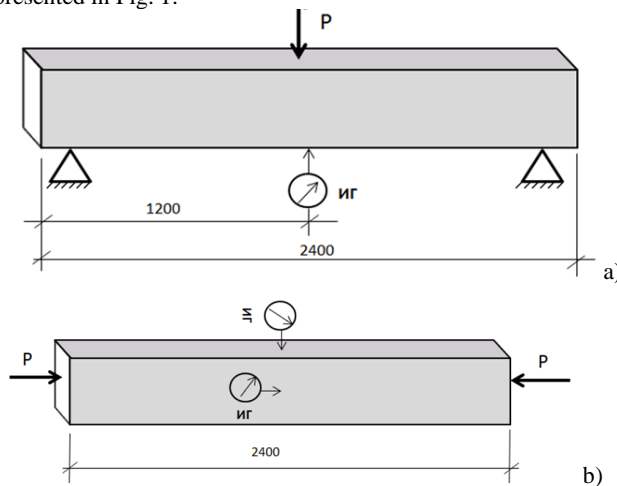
The determination of the carrying capacity of concrete-filled steel tubes samples: a) bend test pattern; b) compression test pattern
